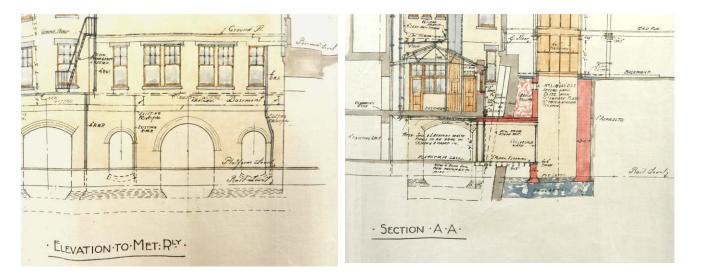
Sectional elevation, 1916 (GLC/AR/BR/22/BA/043620) Photo 16 Sectional elevation, 1916 (GLC/AR/BR/22/BA/043620)
